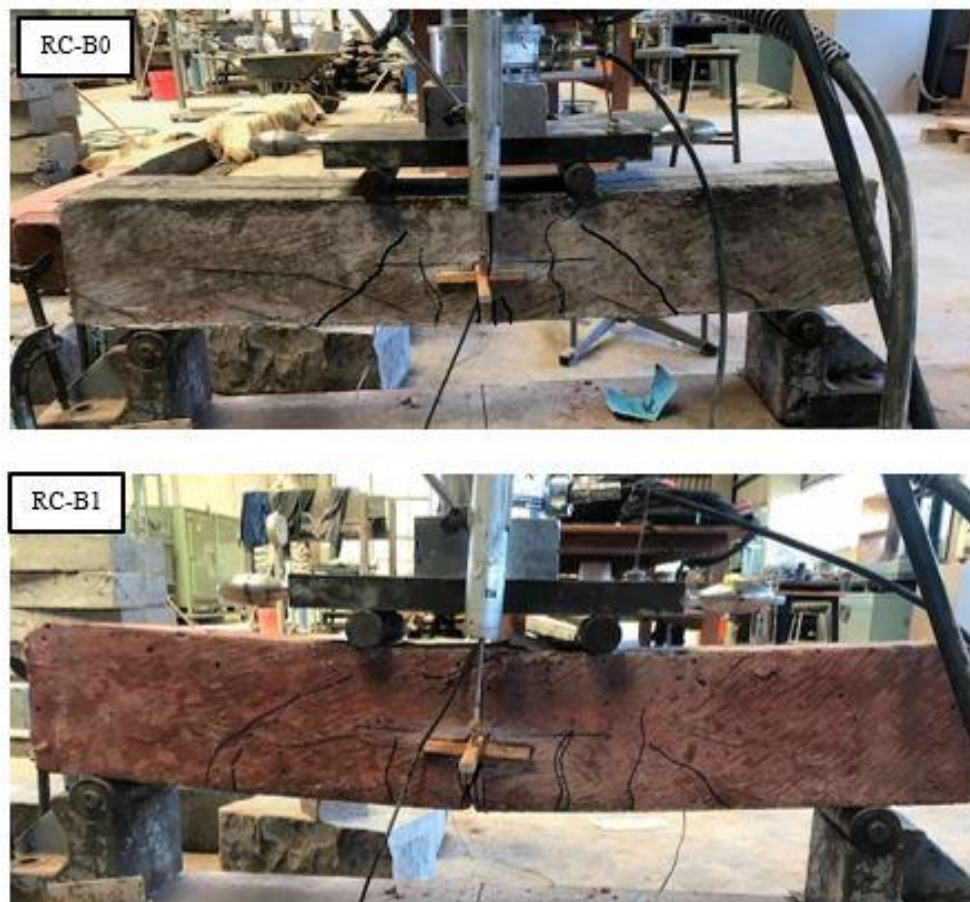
Crack patterns and failure mode of different beams specimen.
